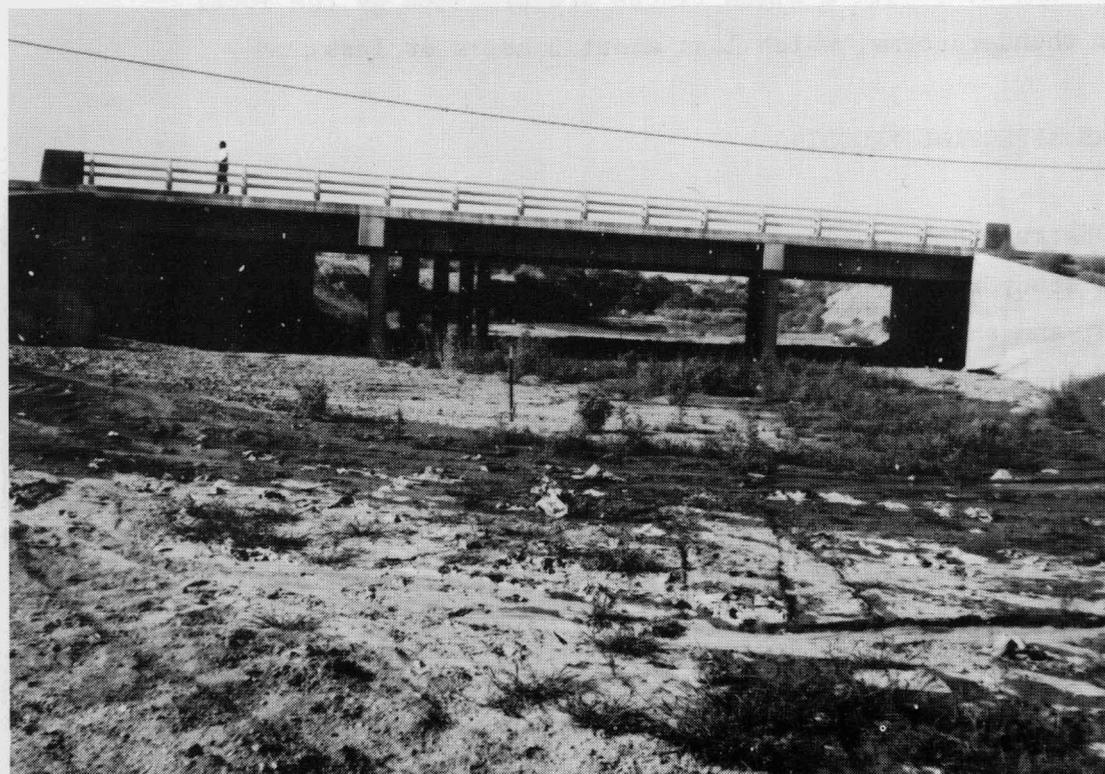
Thunderbird Road bridge (looking upstream)
